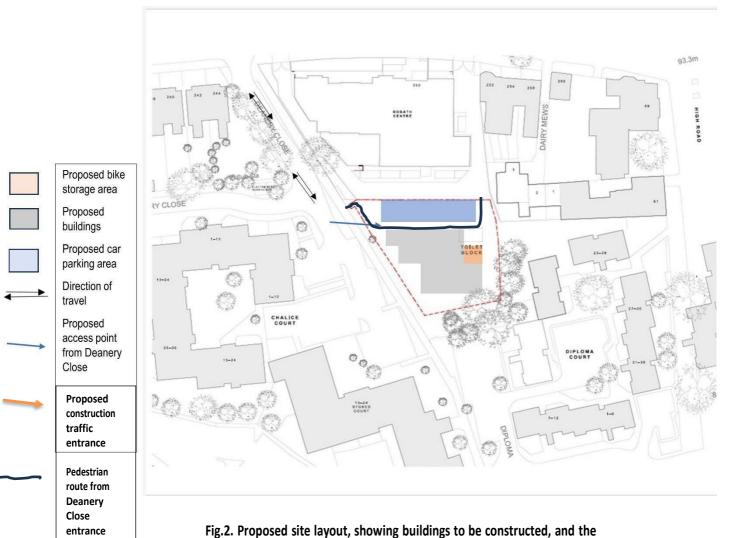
Proposed site layout, showing buildings to be constructed, and the proposed entrances for both construction traffic from East End Road, and the proposed pedestrian entrance from Deanery Close.
